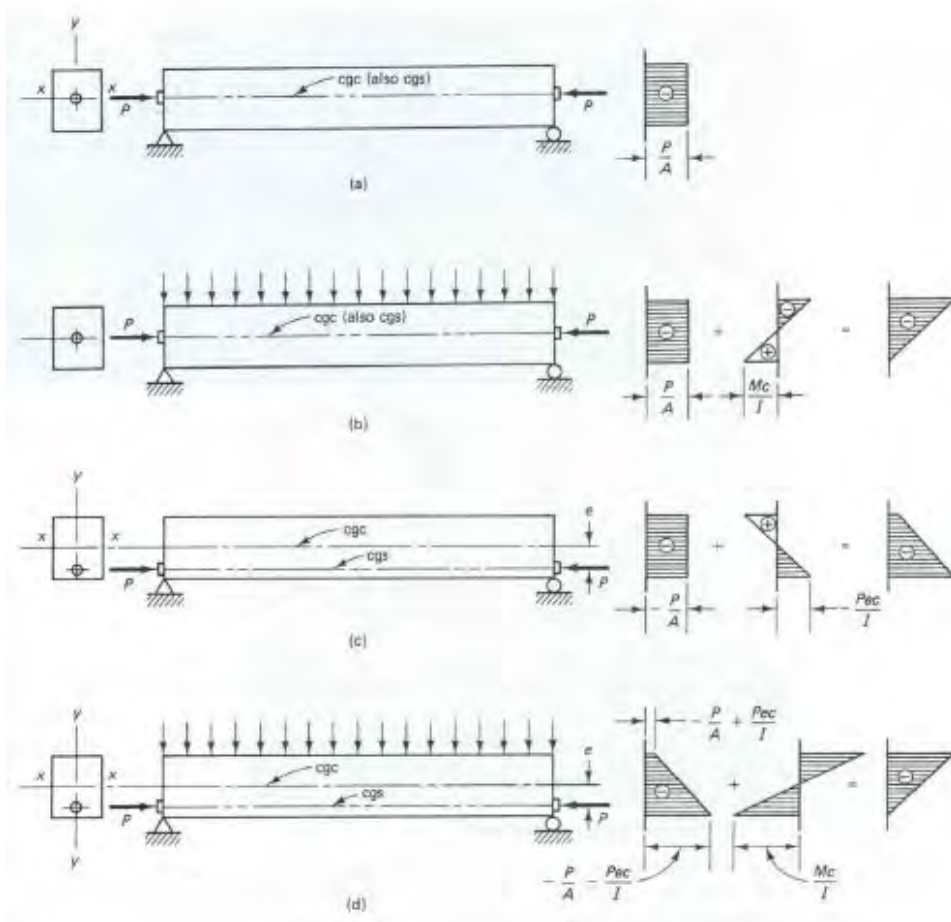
Stress distribution in prestressed concrete beam (Nawy 2006)
